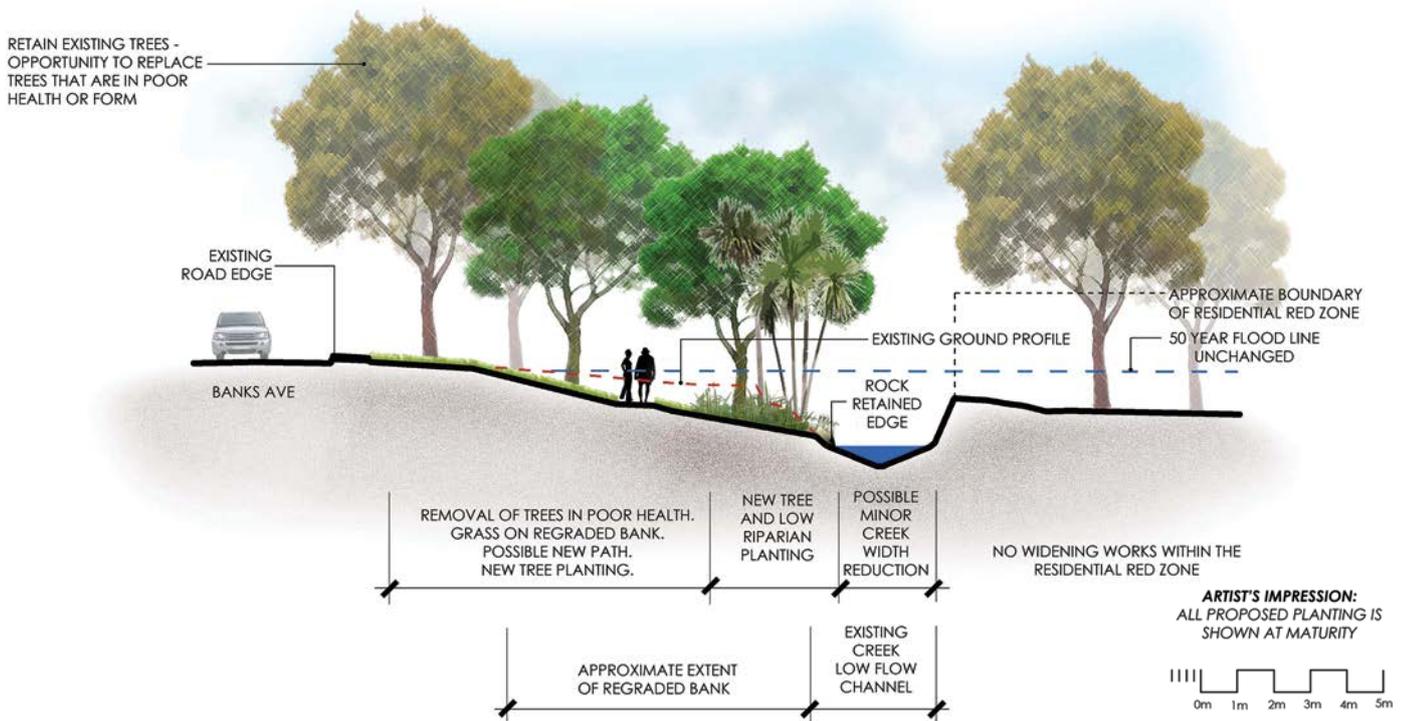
Downstream Option A – Cross Section H (looking downstream from Residential Red Zone)
